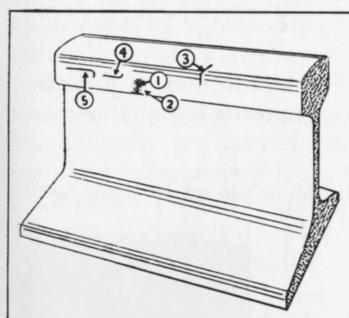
Appearance of transverse defects (except engine burn fracture) in track.
